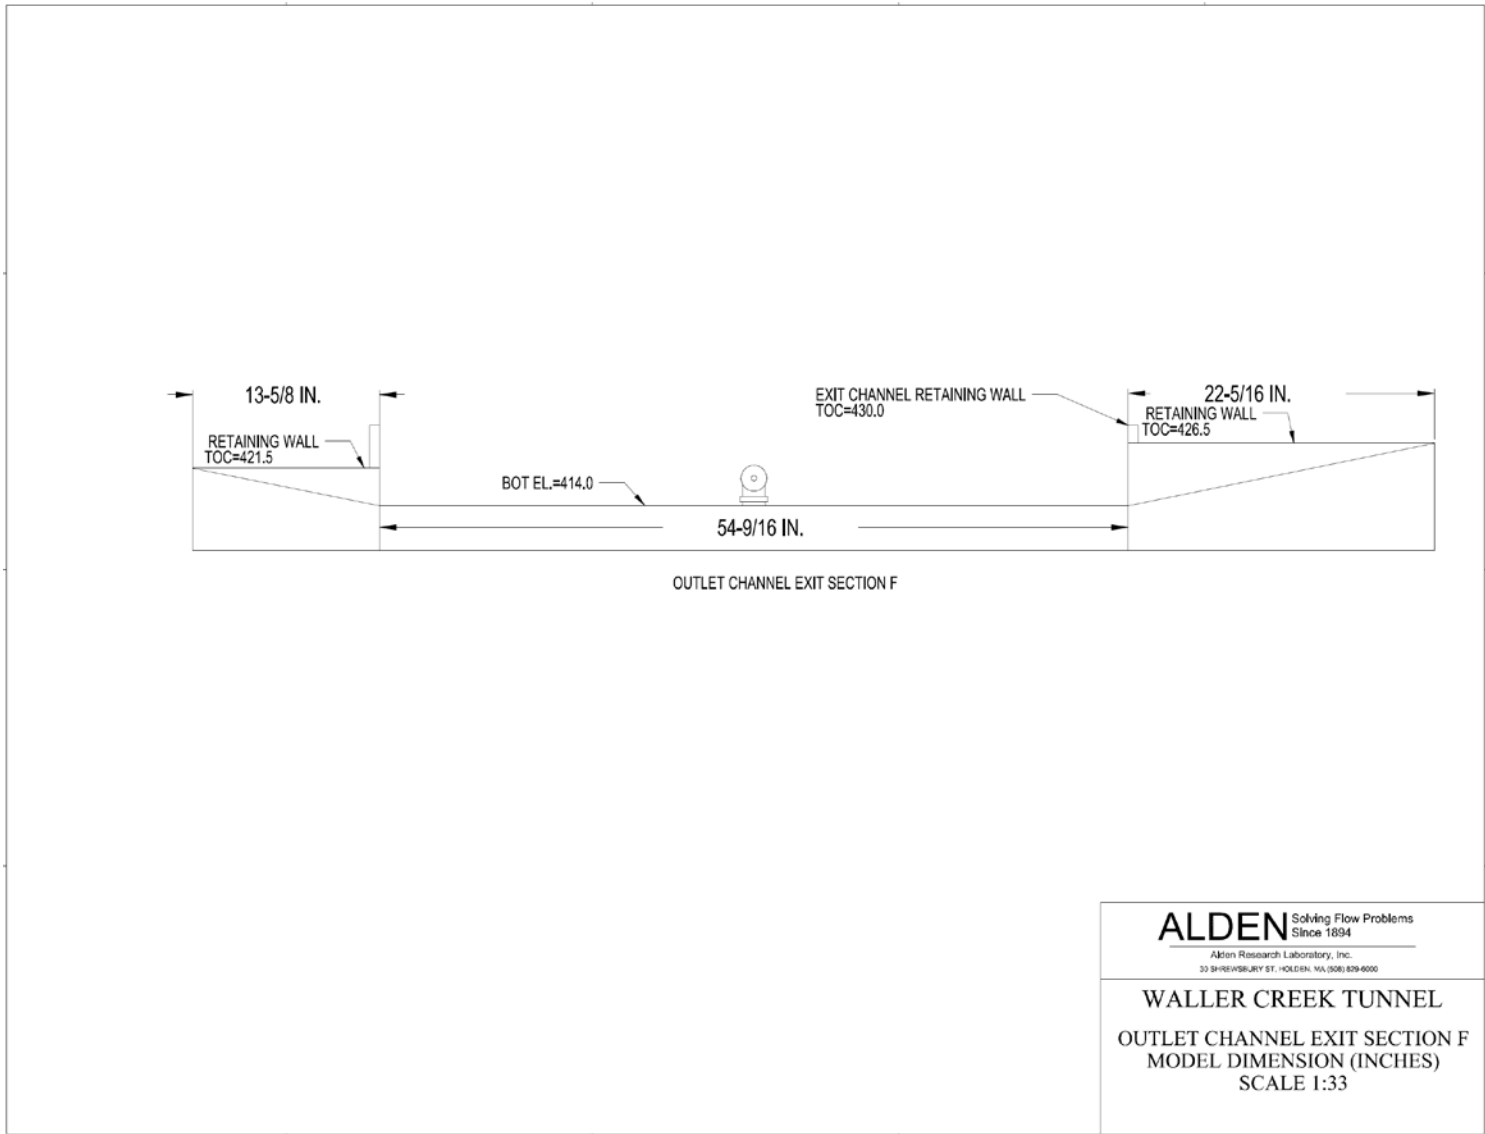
Waller Creek Tunnel Project; 1:33 Scale Model Outlet Dimensions –Section F
